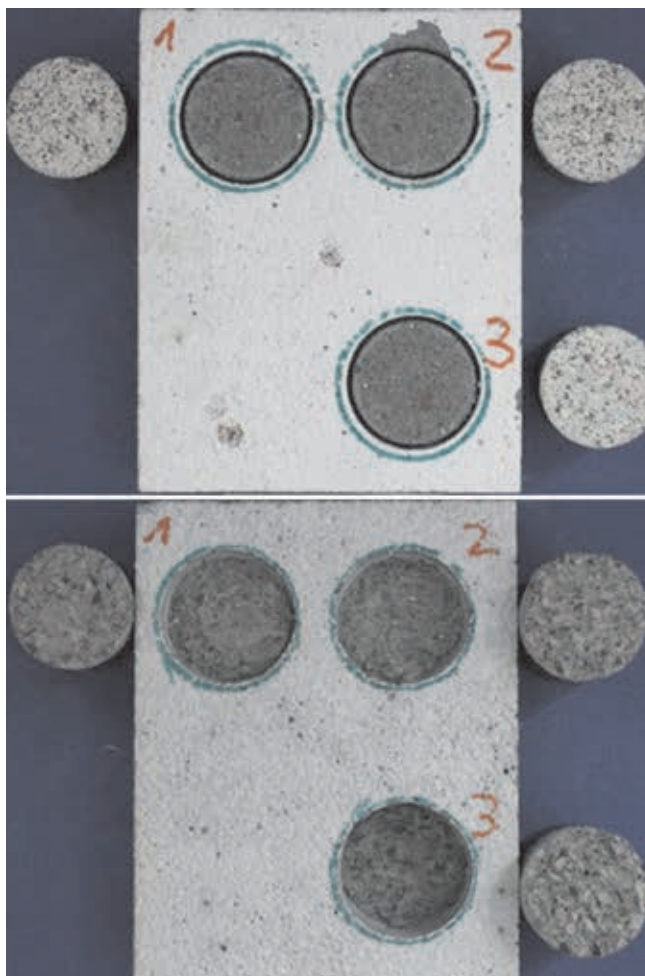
Bond strength test failures of the alumina coating/concrete substrate interface (top); and the concrete substrate (bottom).
